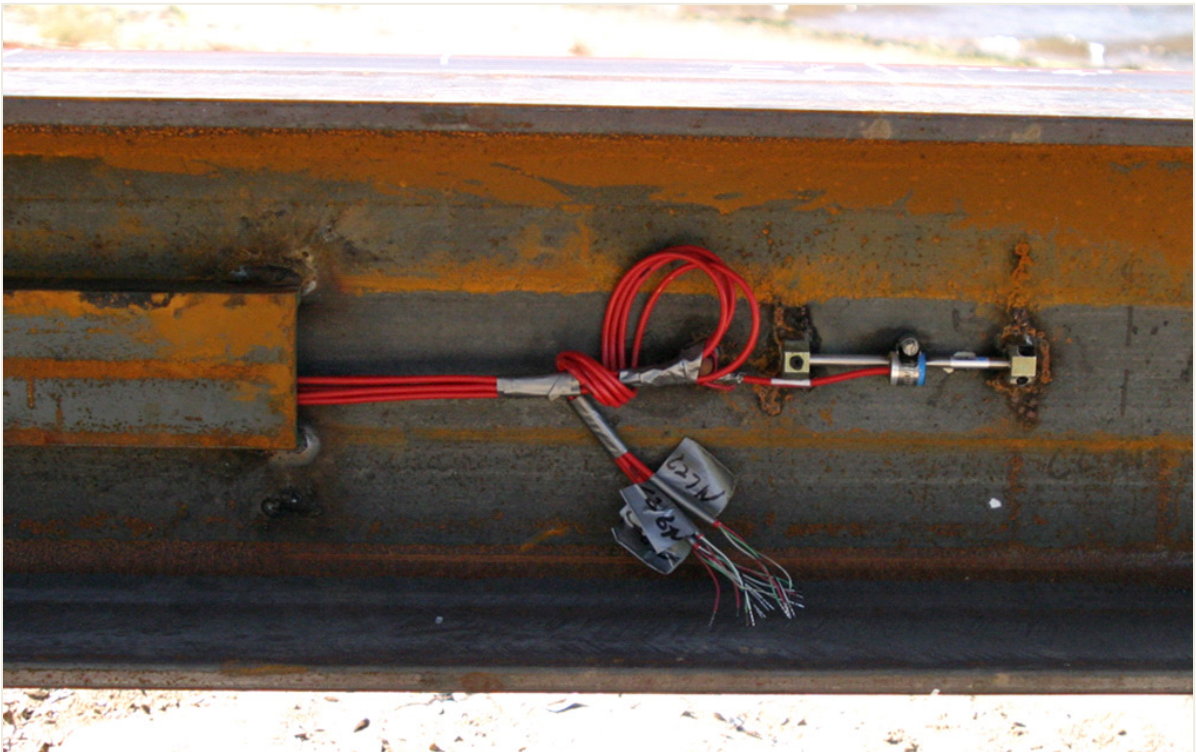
Vibrating wire strain gage with welded anchor blocks and protective channel.
